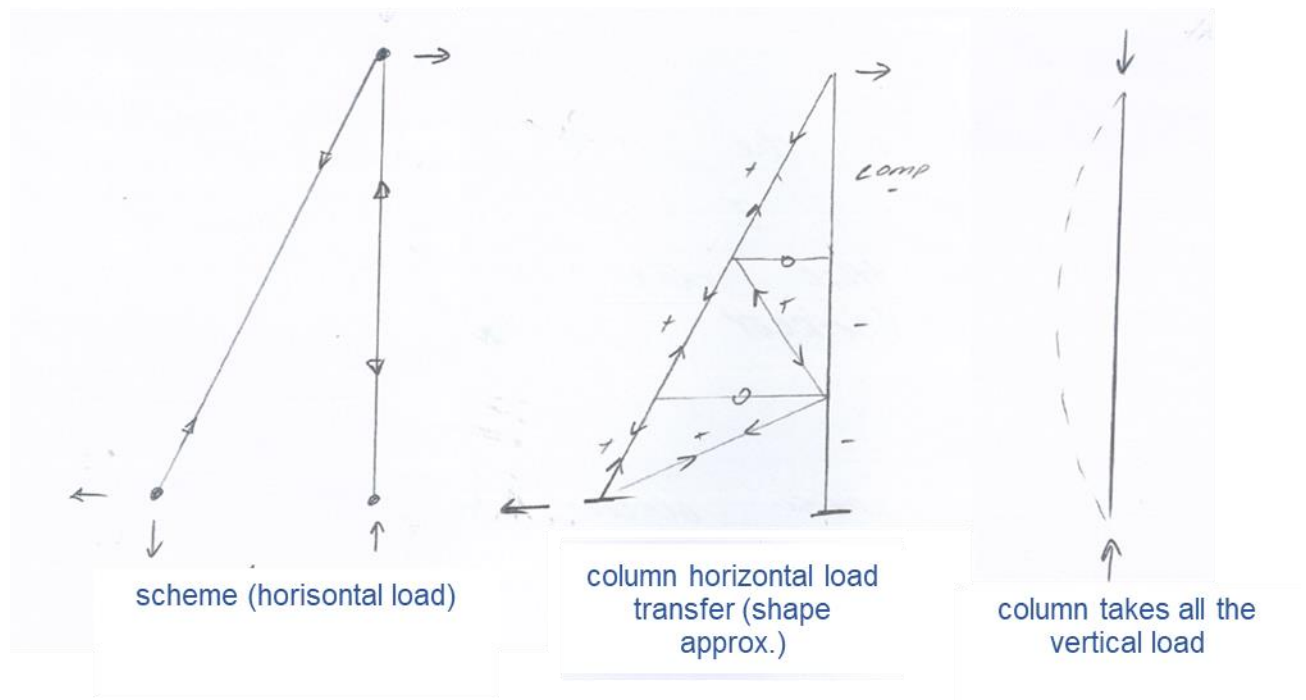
Horizontal and Vertical Forces Transfer: Cable, Columns Truss, Column (vertical chord)
